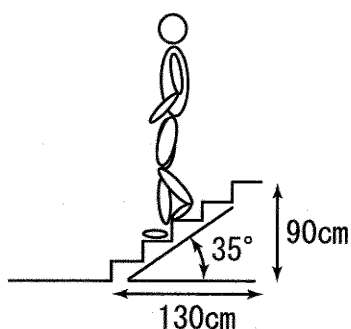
Anatomy of a typical stair (step height – riser 18cm, step depth – tread 26cm)
